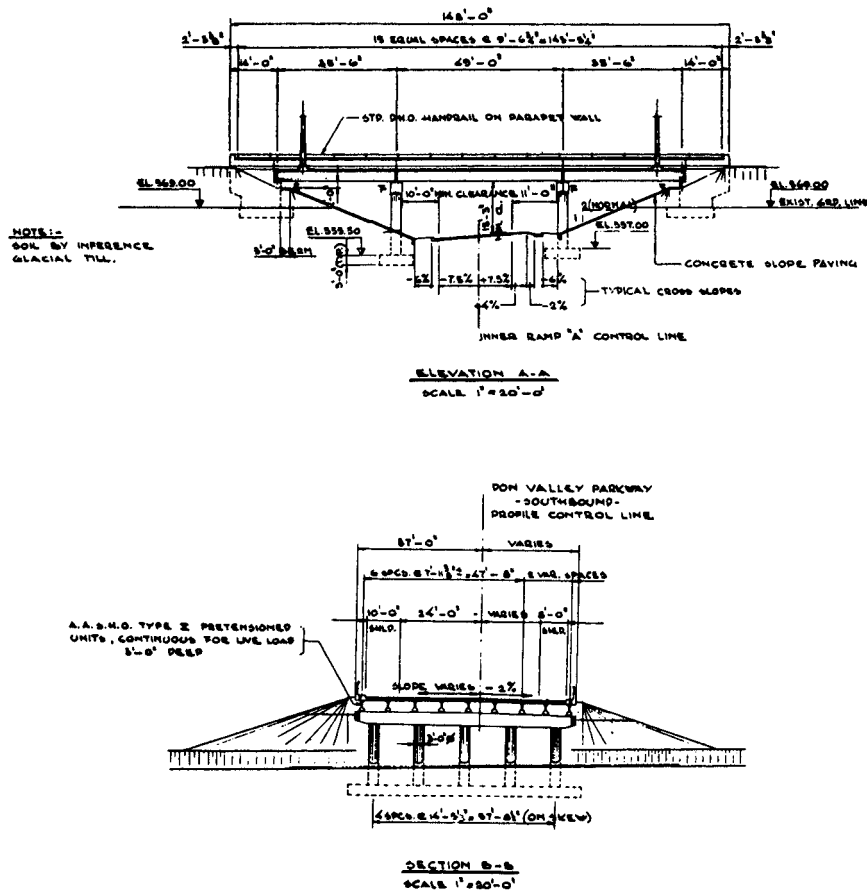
General arrangement plan for Bridge No. 5, Don Valley Parkway, and Highway 401 East off ramp.
